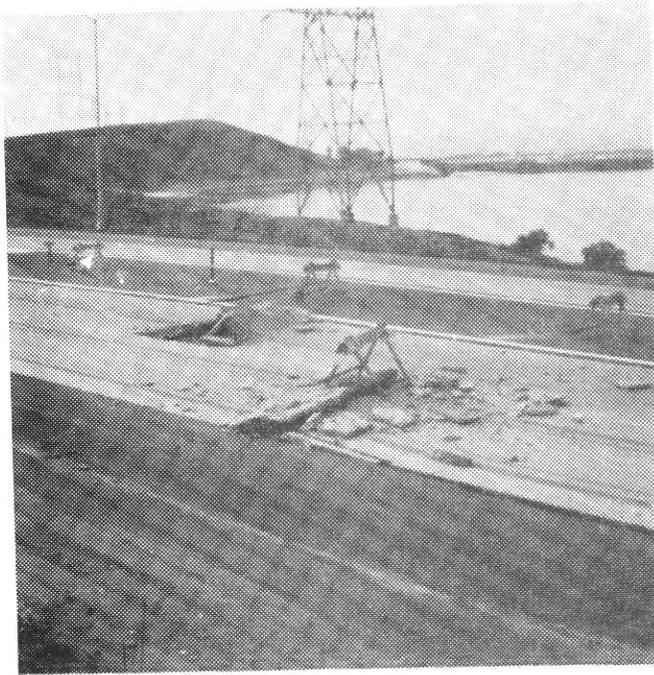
and 23. Breaking and overriding of pavement slabs at transverse joints due to longitudinal thrusting action.
